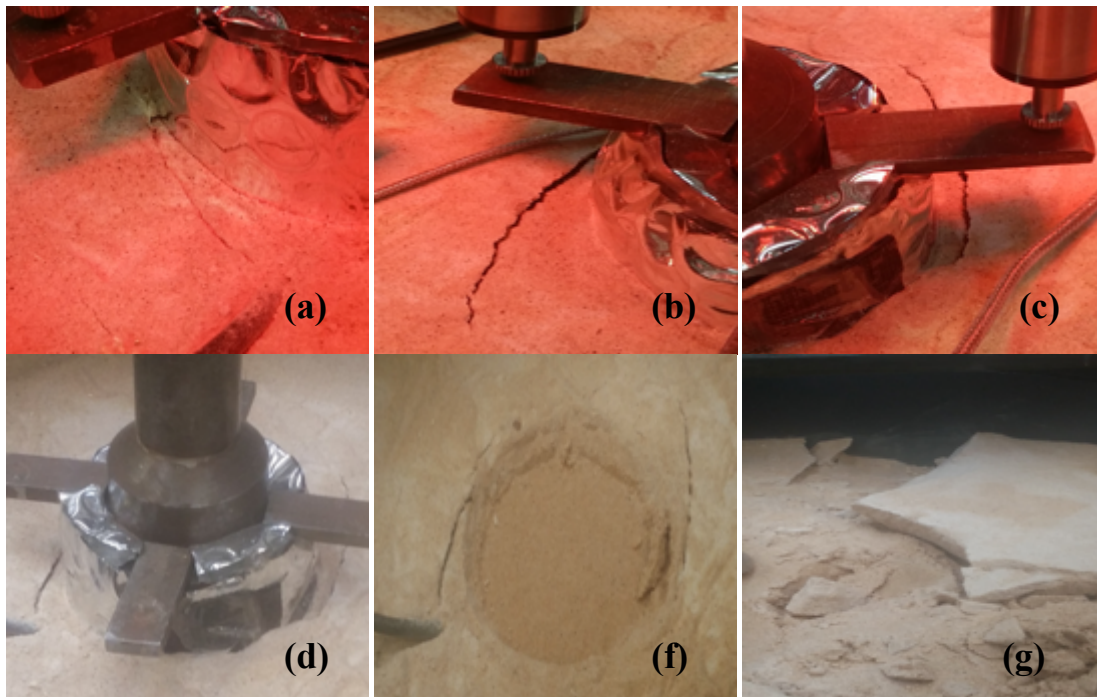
The profile of failure of Case 3; (a) first crack after 24 hours after adding 8 litres (W4), (b) and (c) close view for the final failure, (d) failure after switching off the heating system, (f) the area under the footing, (d) the duricrust around the footing area.
